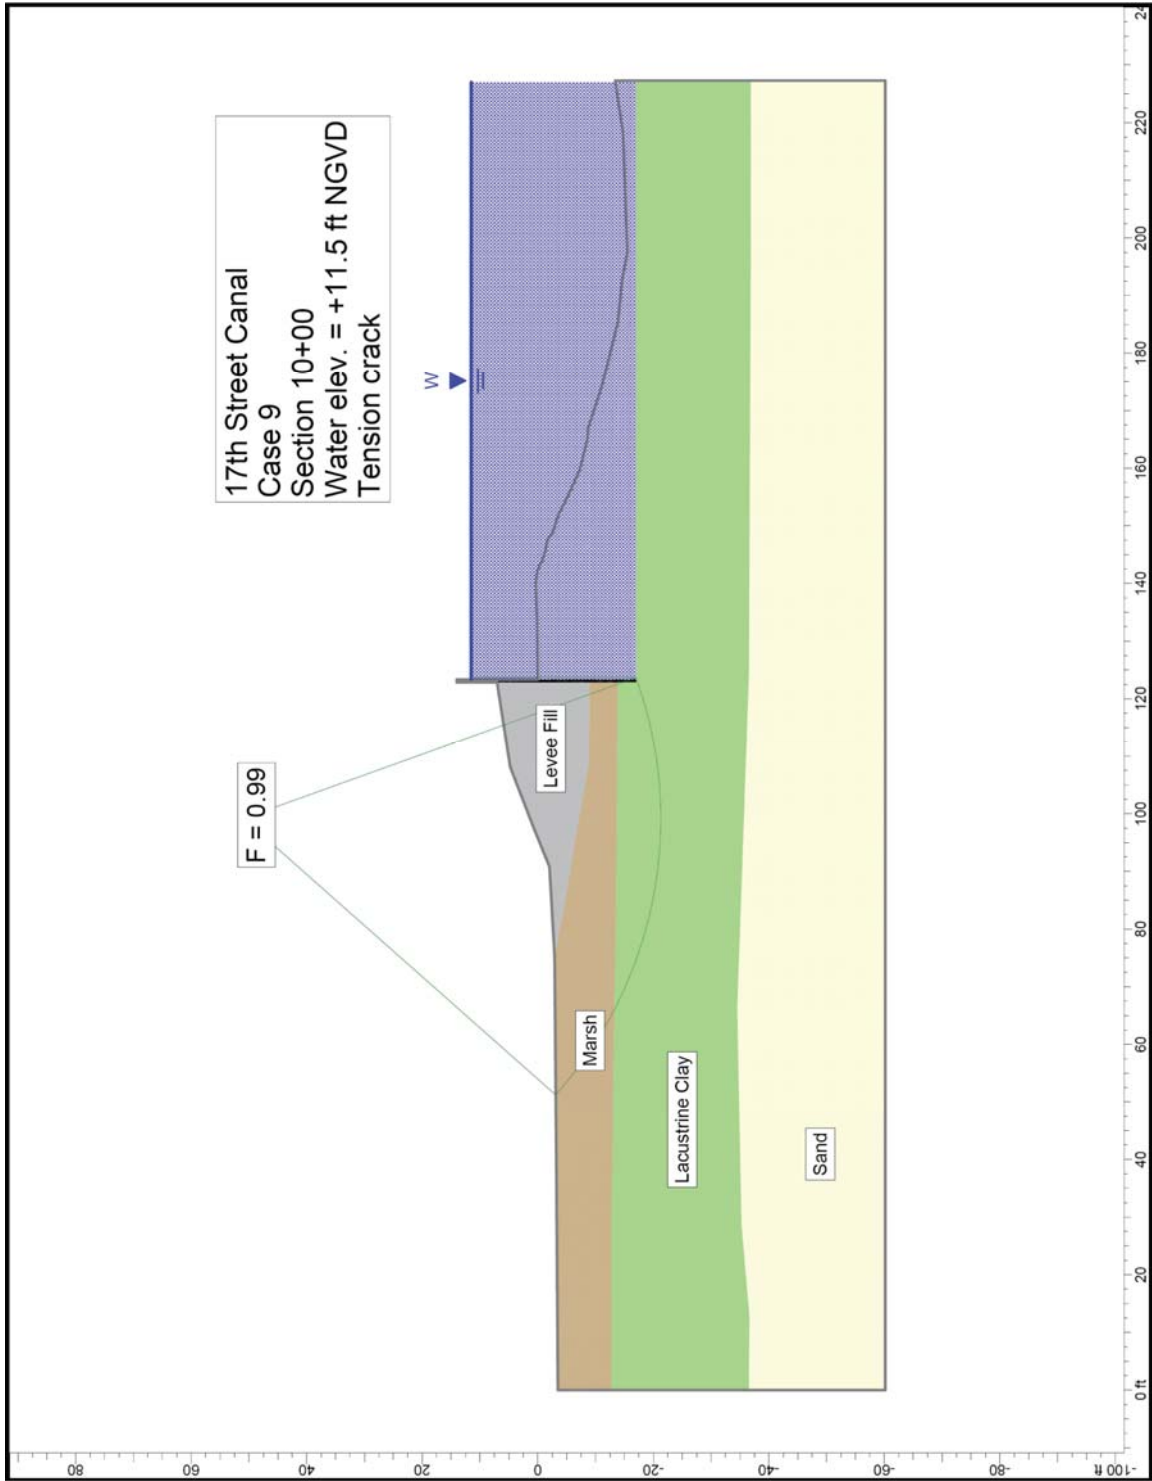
Critical circle for 17th Street Canal Station 10+00 – water elevation 11.5 ft, tension crack.
